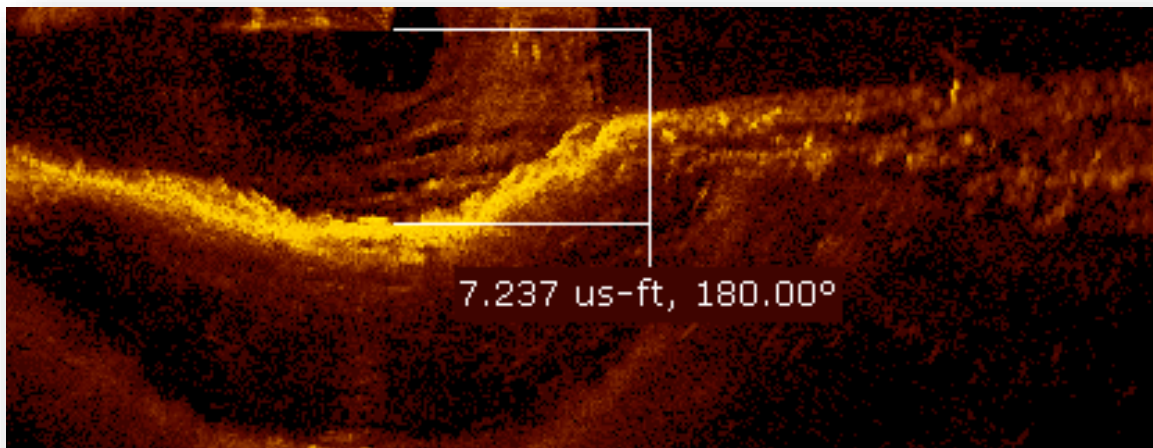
East Abutment, Left Face Minor Scour Sector Scan
